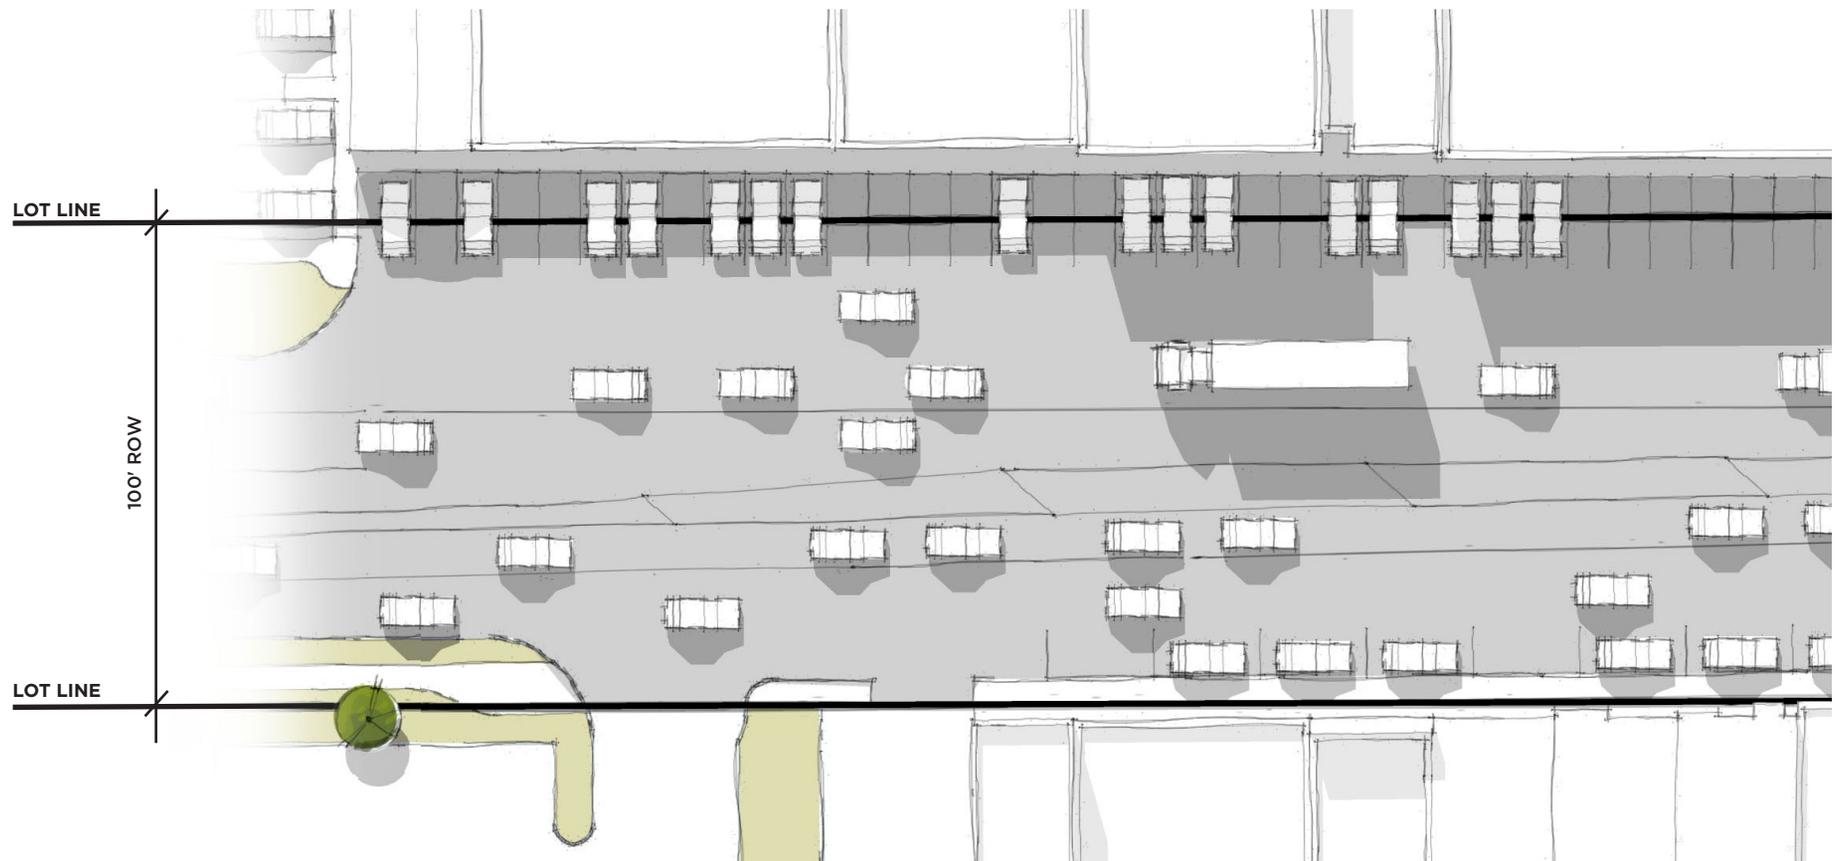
COMPONENT A: PARKING CONFIGURATION - EXISTING CONDITION
